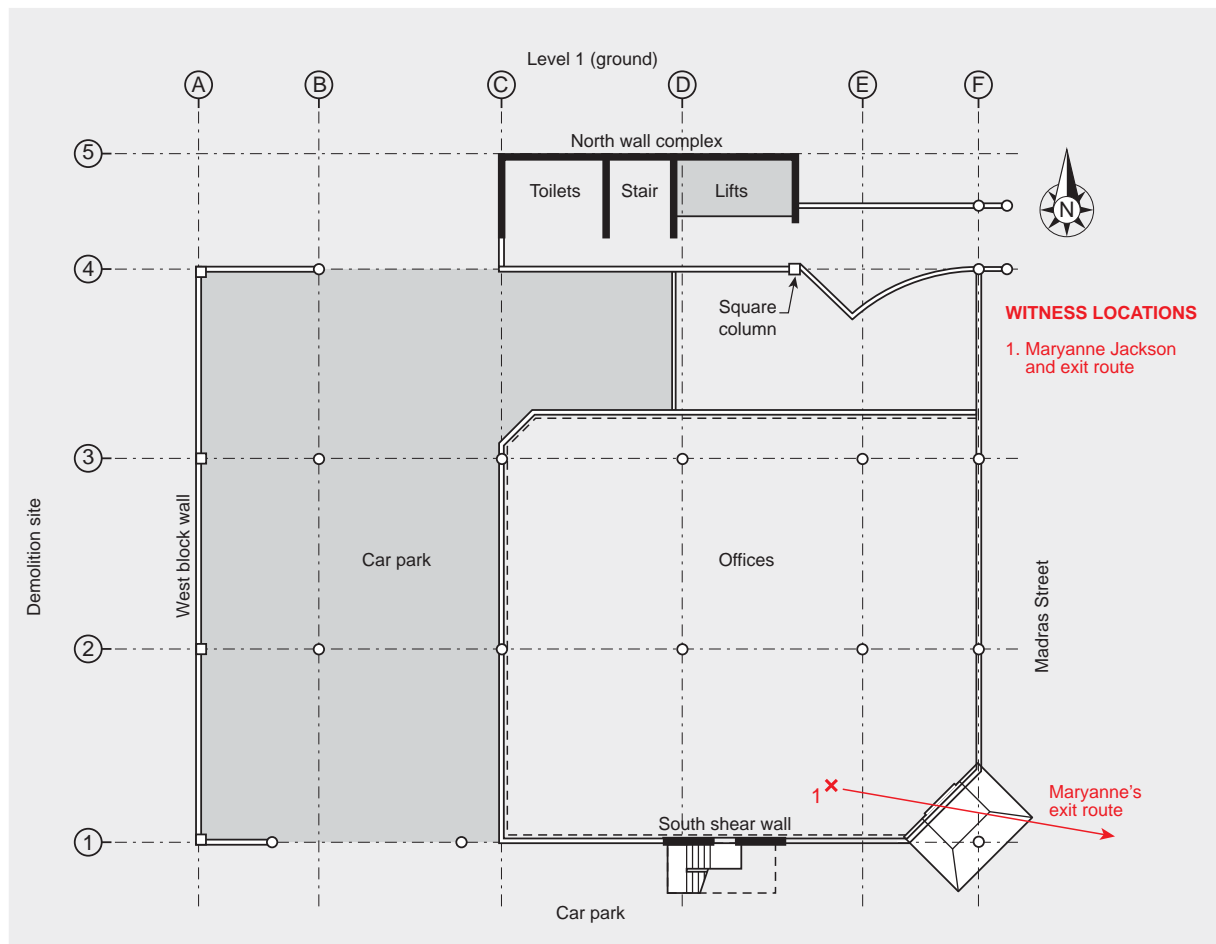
Level 1 floor plan showing the location and exit route of Maryanne Jackson
